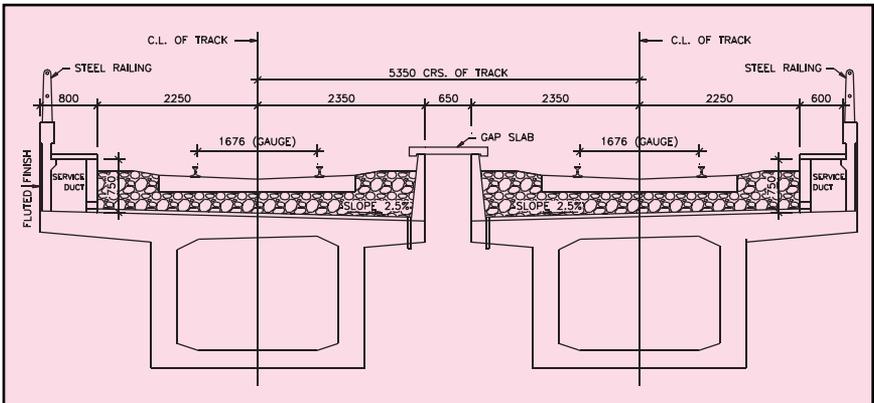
Typical Cross section of PSC box girder for spans 20m to 30m (each track)
